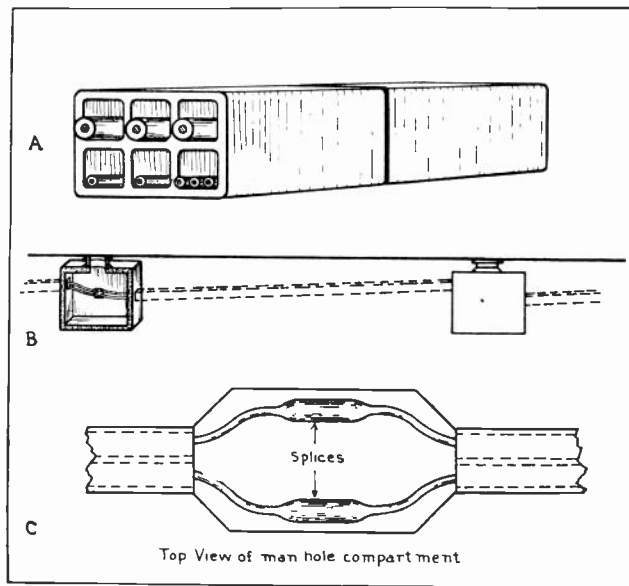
"A" shows underground conductors run in tile ducts. "B". This sketch shows the arrangement of man holes and cable ducts underground. "C". Cables spread apart and supported in racks on the walls of man holes allow working room for making splices, tests, etc.
